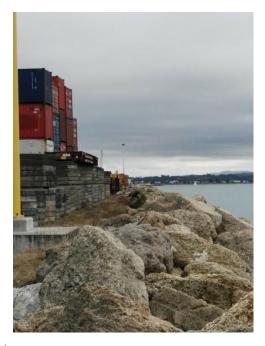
Revetment wall to be affected, showing limestone boulders which will be removed as part of wharf construction.
